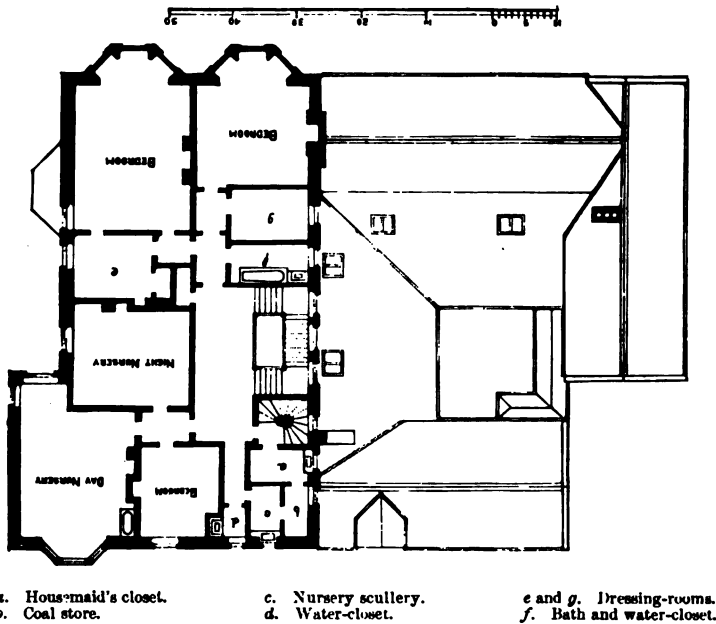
HOUSE AT WESTOE.—PLAN OF BEDROOM FLOOR.
